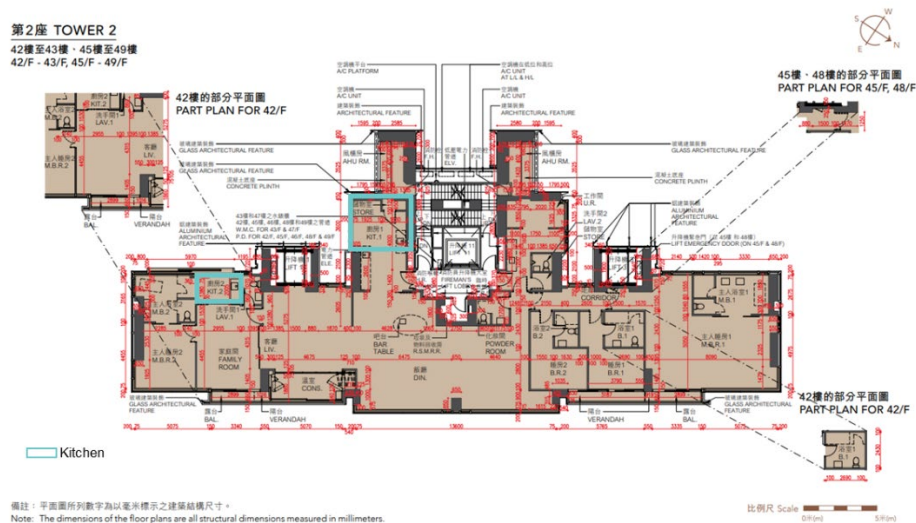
Floor Plan with Dual-Kitchen Arrangement at The Legacy in Mid-Levels West¹⁰ (Modified by Author)
